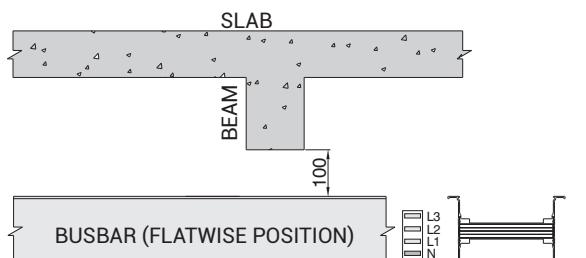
CROSSING UNDER A BEAM HORIZONTAL POSITION
